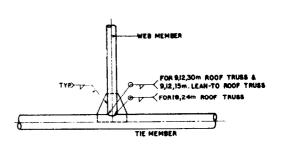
DETAIL T3 FOR A-TYPE TUBE TRUSS
